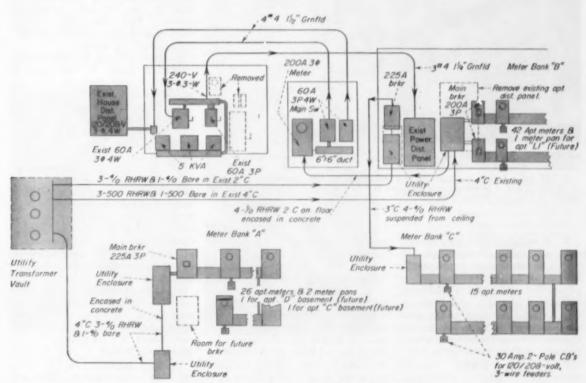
New distribution and metering arrangements consist of a revision of old layout of meter bank "B" and addition of new meter and feeder layouts at new meter banks "A" and "C".
